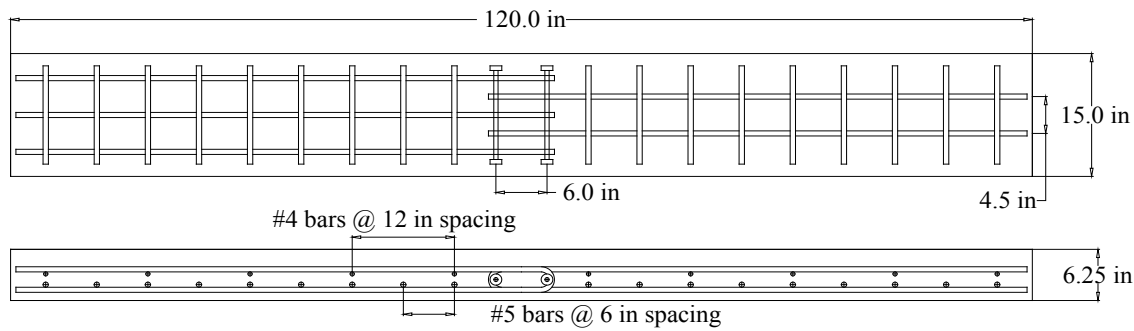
WB-1 longitudinal joint specimen (Tested in Phase I)
